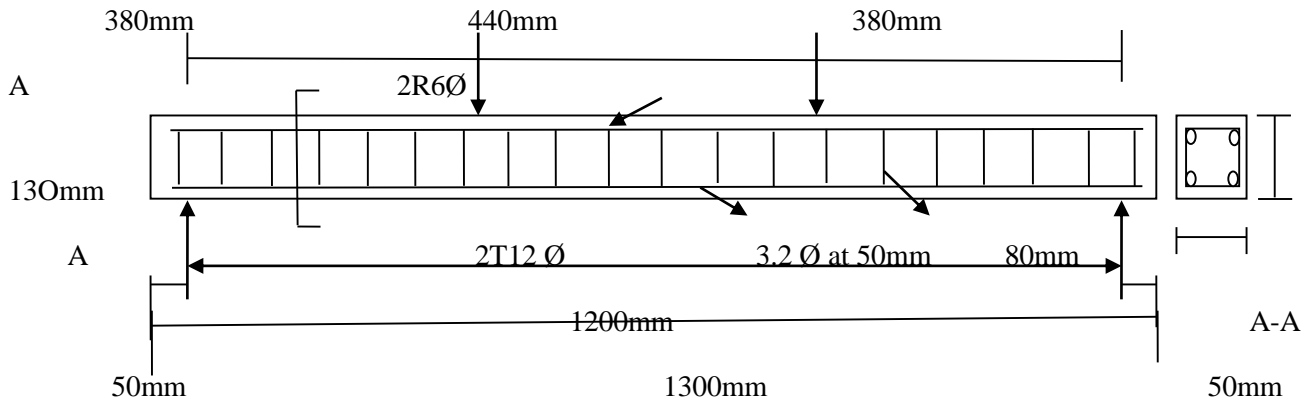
beam 3 - beam with links and poor anchorage of longitudinal reinforcement.
